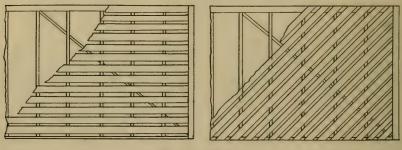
HORIZONTAL AND SLANTING BOARDS ON CORN CRIB.
